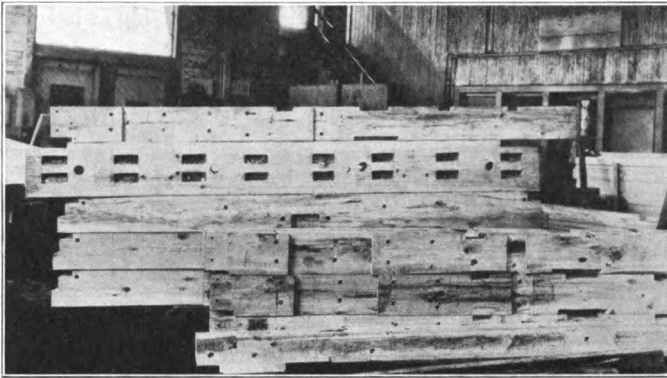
Parts Marked by the Layer-Out and Milled by the Machine-Hand.
